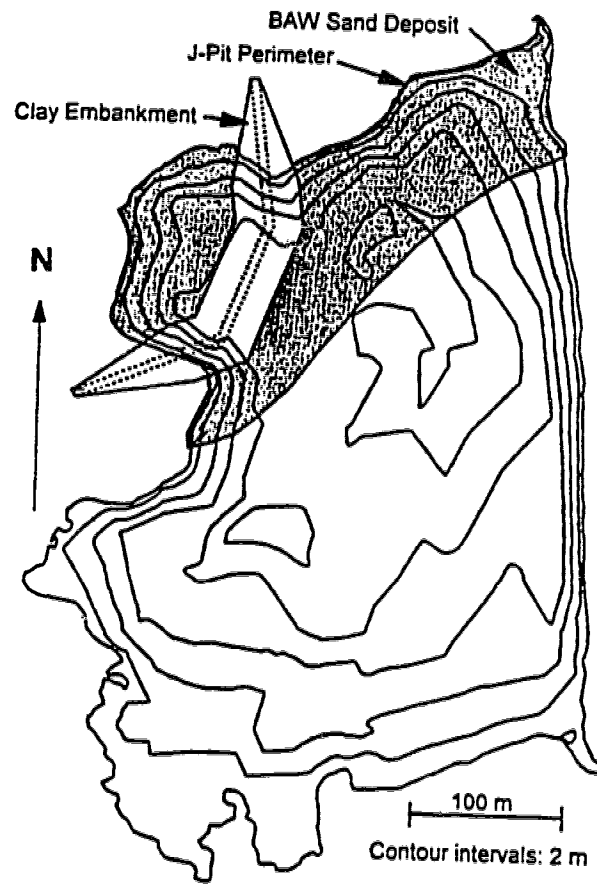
Plan View of Field Event in J-Pit.
